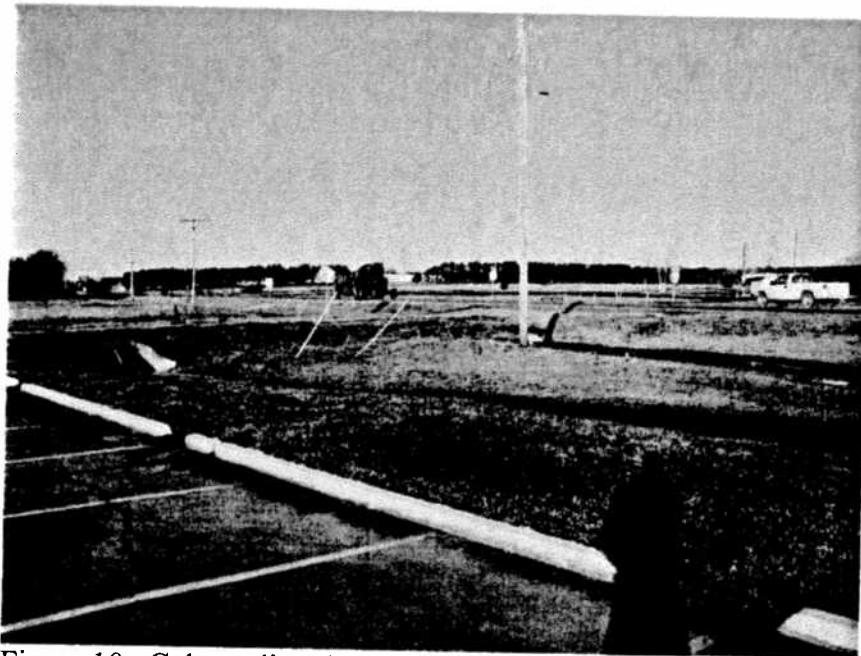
Culvert directing overflow from pond east along north property line – facing west-northwest.
